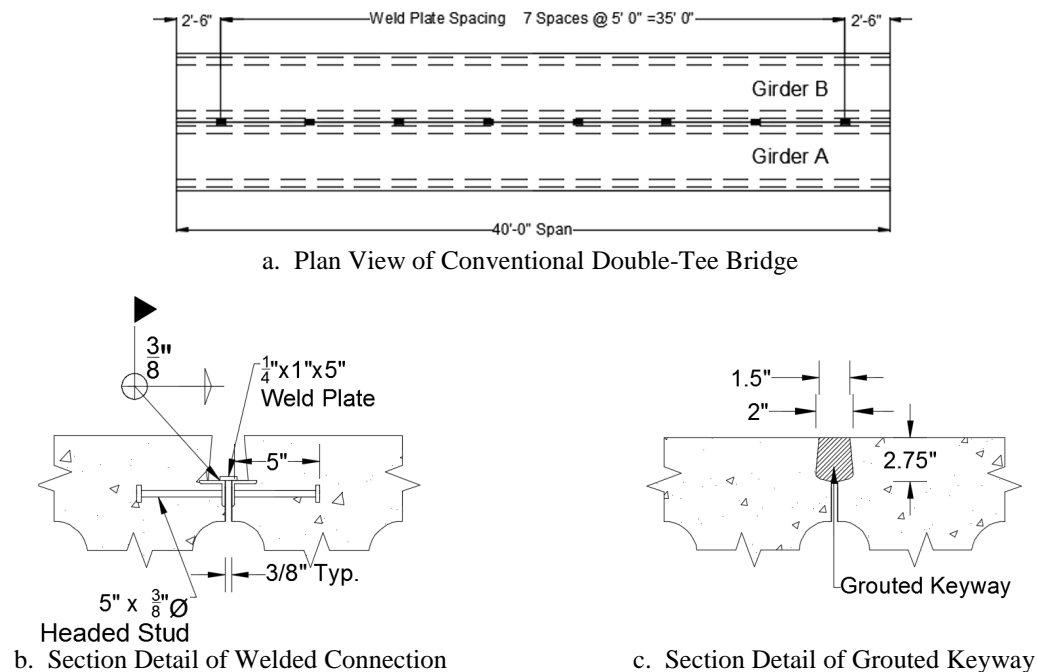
Conventional Double-tee Girder Longitudinal Joint Detail (Konrad, 2014)
